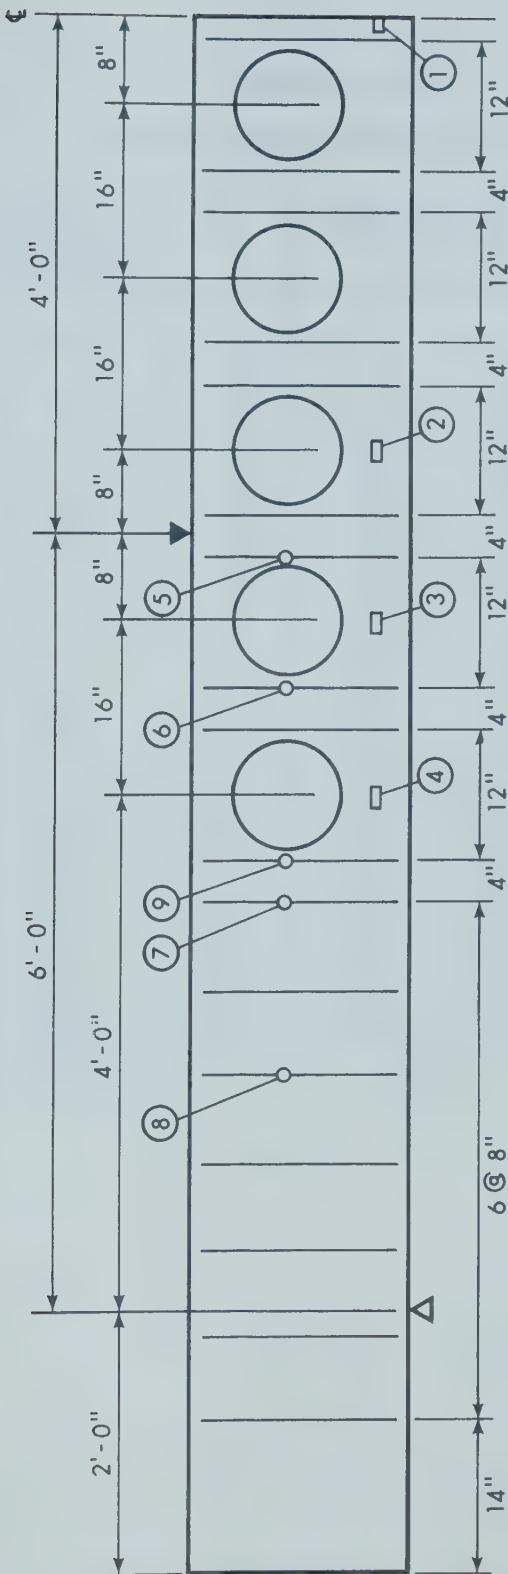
BEAM AD-1 REINFORCEMENT AND GAUGE DETAILS
